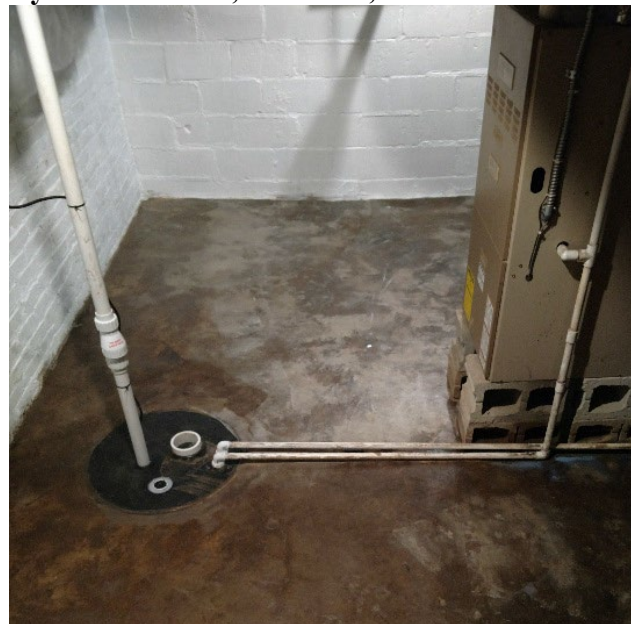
Sump pump was replaced, pit was sealed with silicone and a new lid was mechanically fastened.
